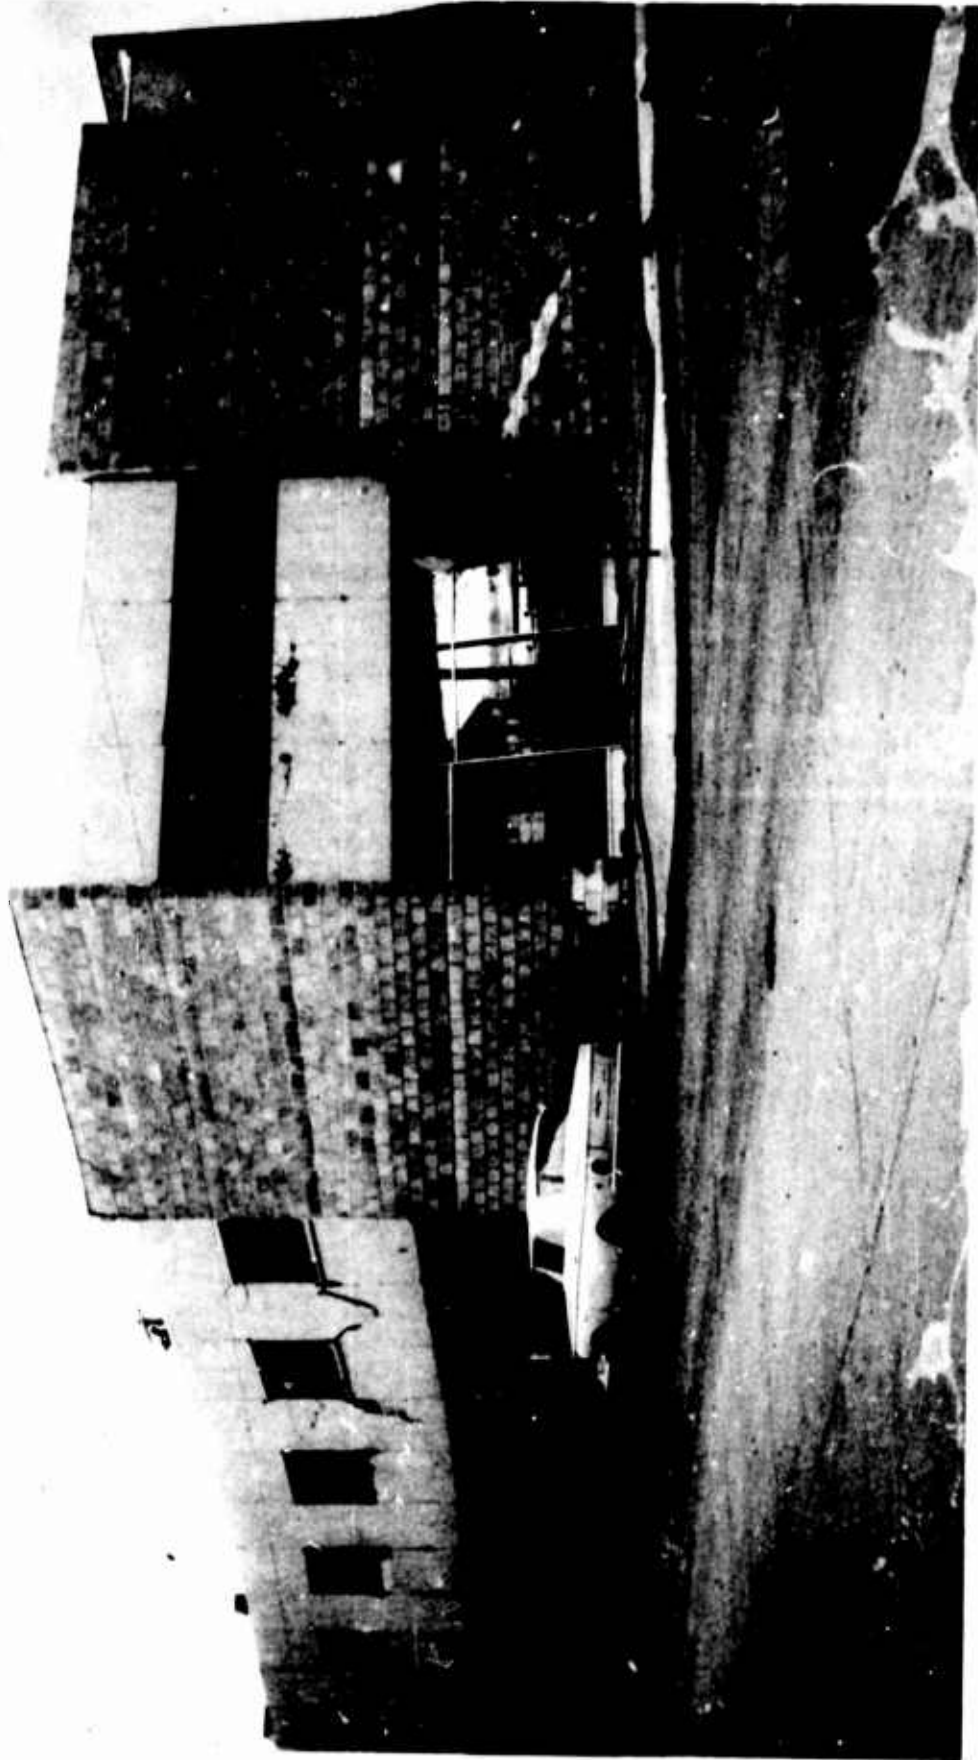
L Street Slide (Commercial building at Fourth Avenue and K Street)
